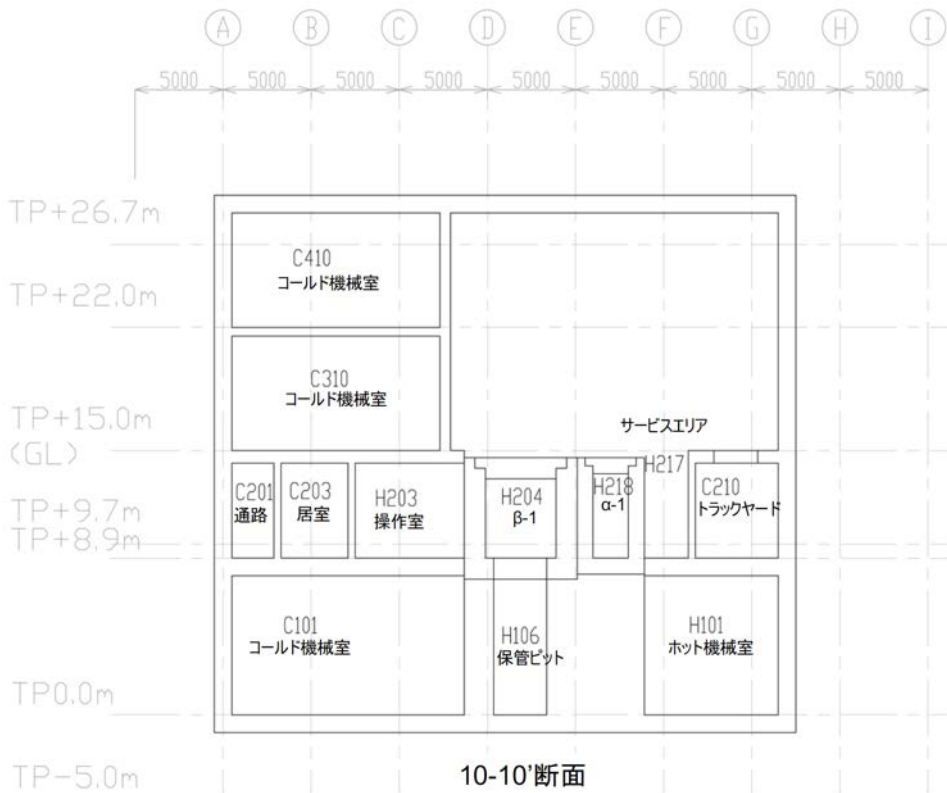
Elevation view of PIE facility (10-10').
